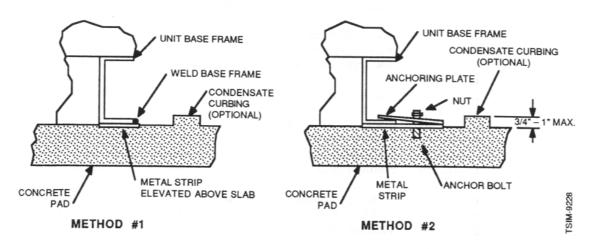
Typical Concrete Pad Detail - Icemaker To Concrete Pad
